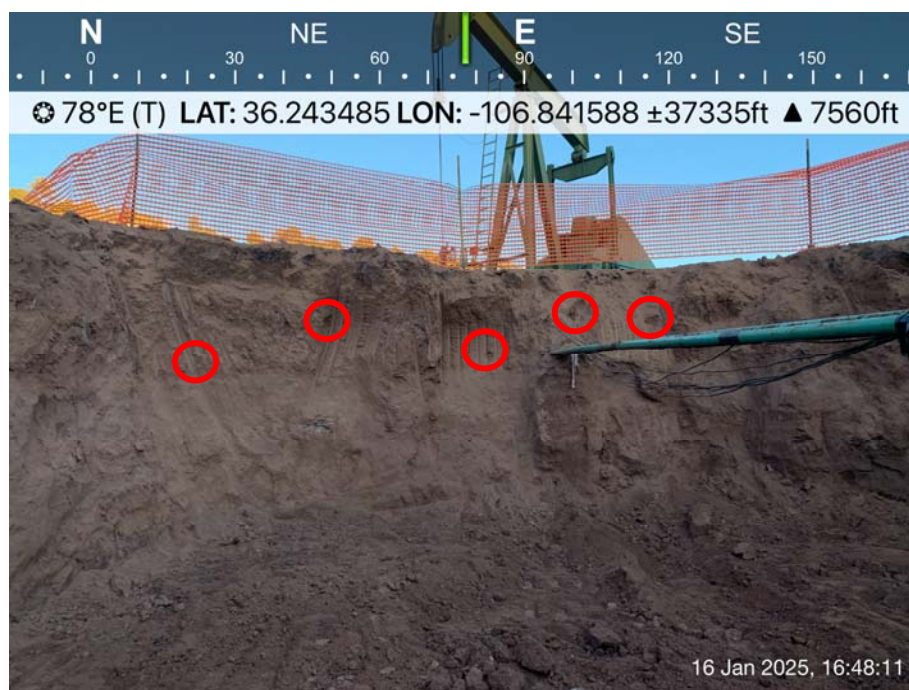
SS03 collected as a five-point composite sample 0-4 feet (ft) below ground surface (bgs) from east sidewall of excavation.
